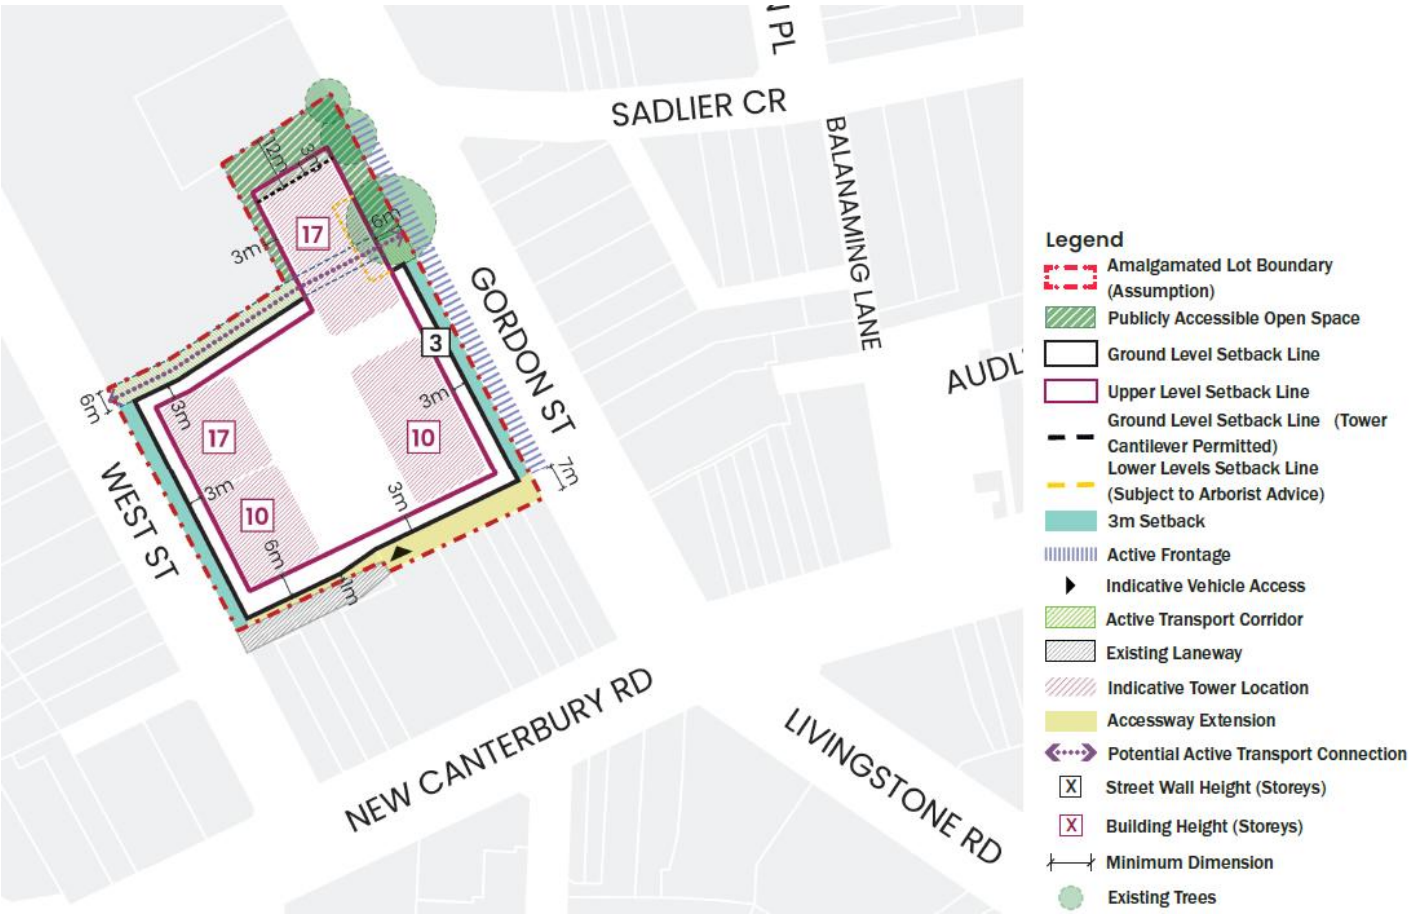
Gordon Street/West Street Precinct - Indicative Layout and Design Principles
